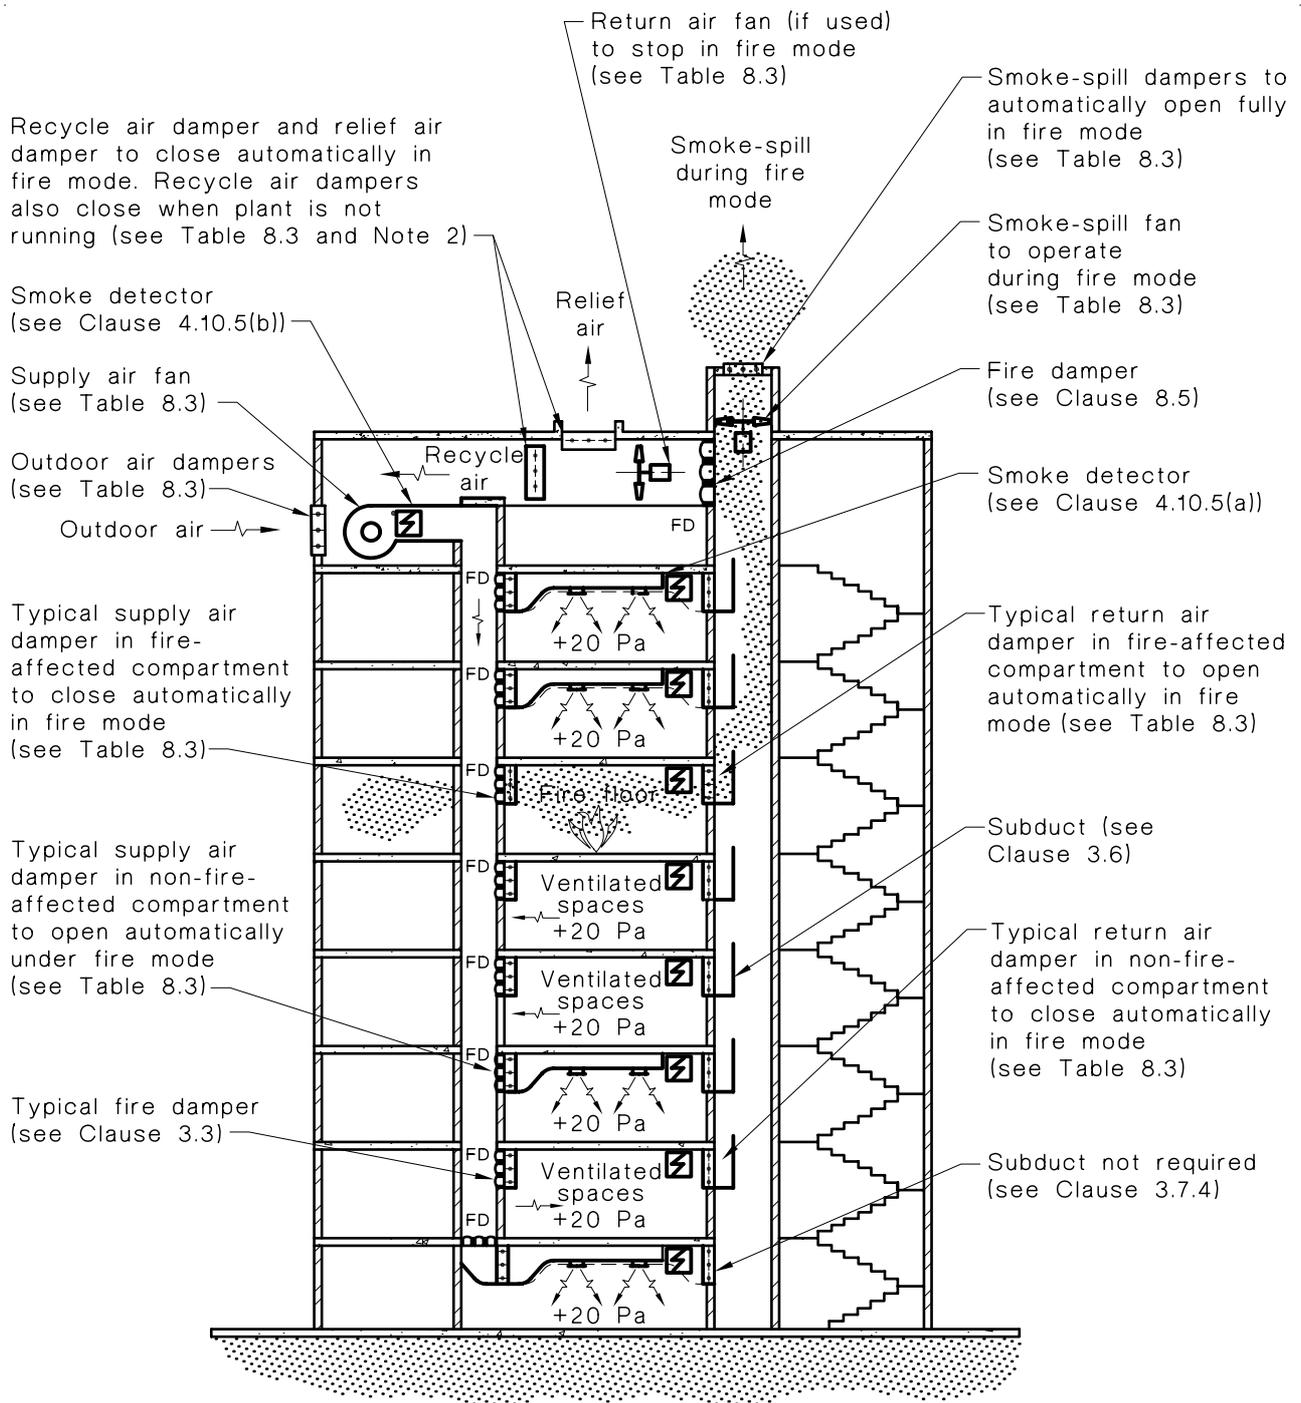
ZONE PRESSURIZATION SYSTEM—TYPICAL INSTALLATION WITH PLANT ROOM ABOVE SPACES BEING SERVED
